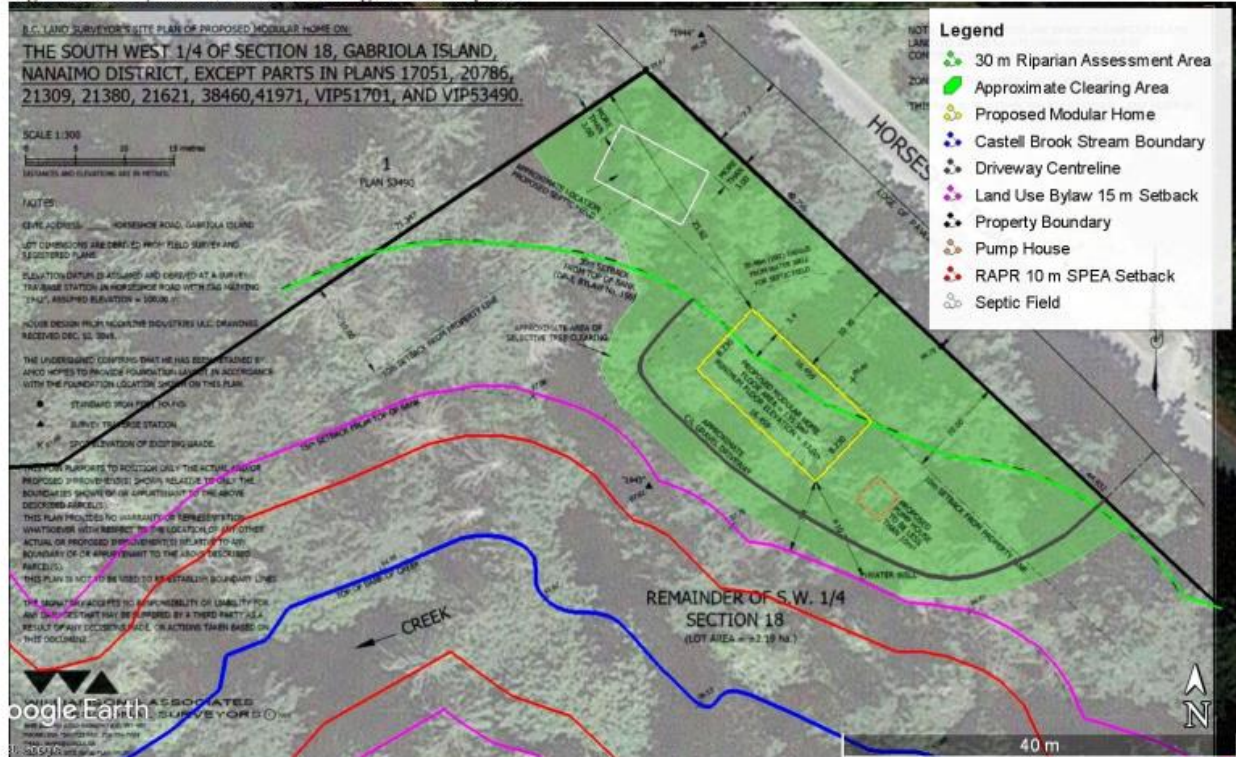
Survey Site Plan overlaid on August 2016 air photo
